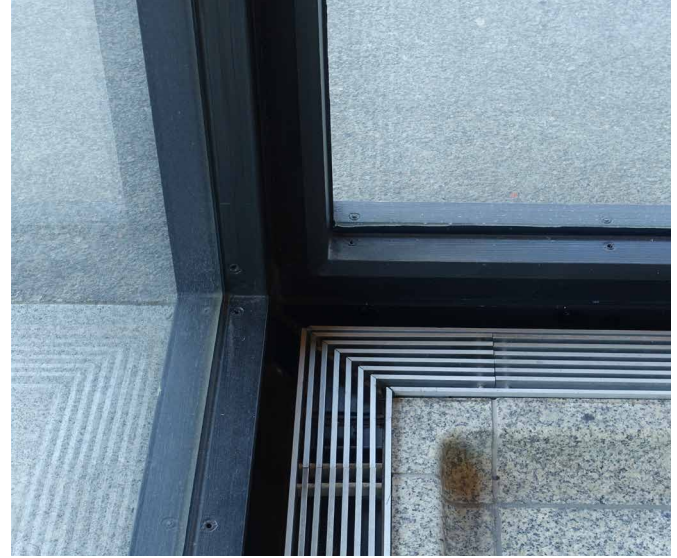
New National Gallery, Berlin: New facade with a single glazing in a thermally non-separated construction / Photo: F. May
